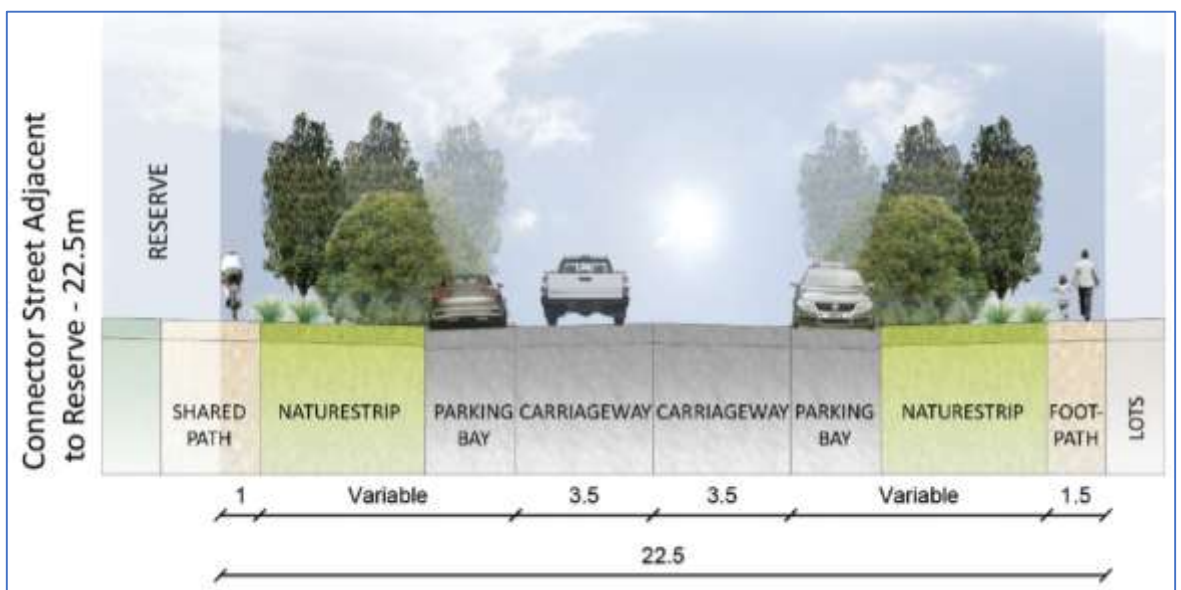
Proposed Collector Street Adjacent a Reserve (22.5 metres)
